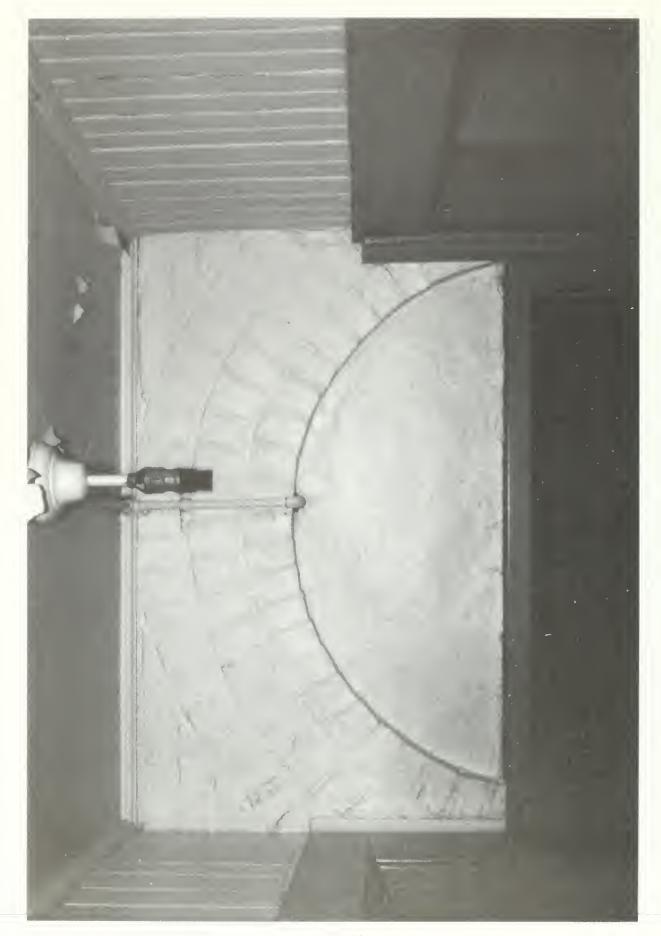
Room 114 (Rear Stairway), arched lintel of exterior doorway.
